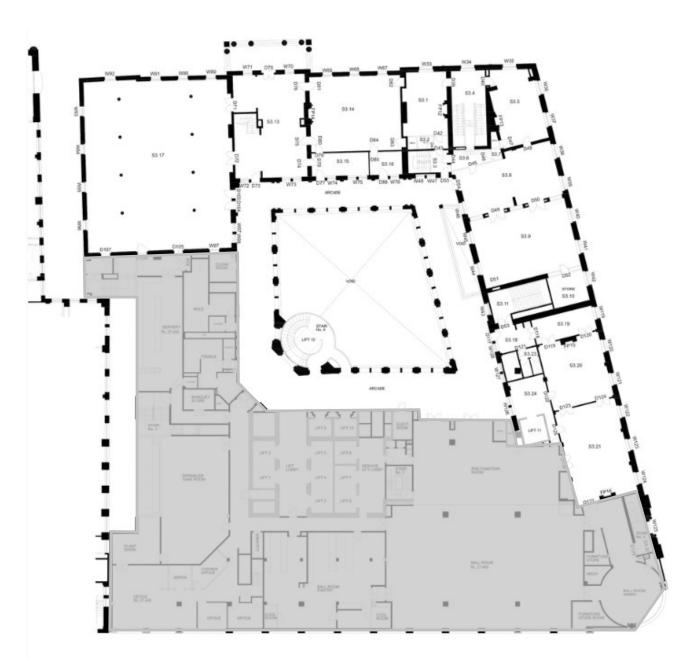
Reference plan – First floor (area not addressed in this report shaded grey).
